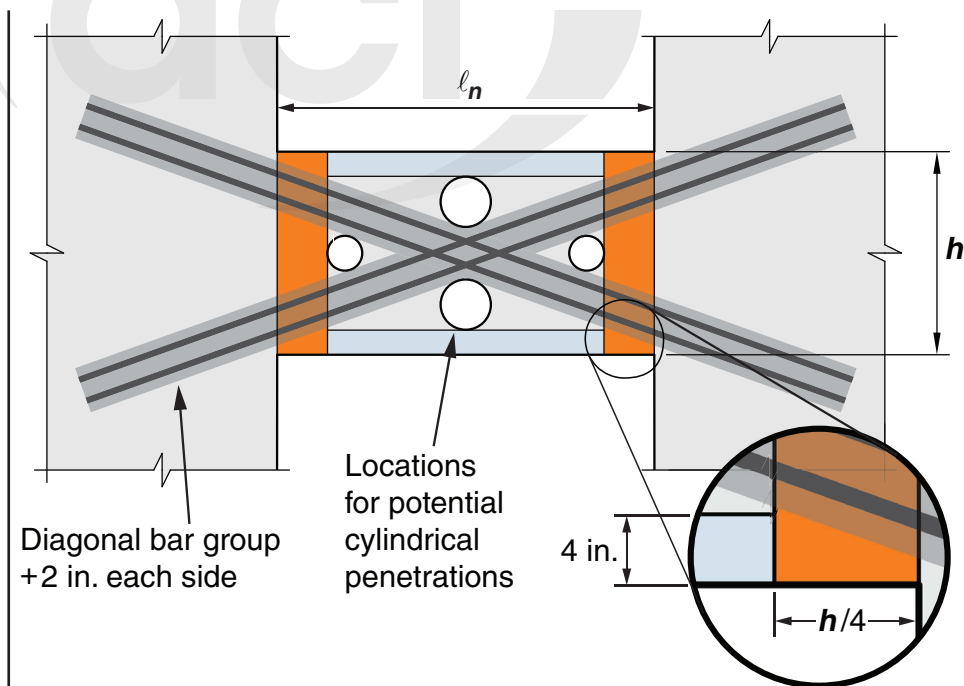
Coupling beam elevation showing prohibited penetration regions shaded. Note that four potential locations for penetrations are shown although only two are permitted in any one beam.
